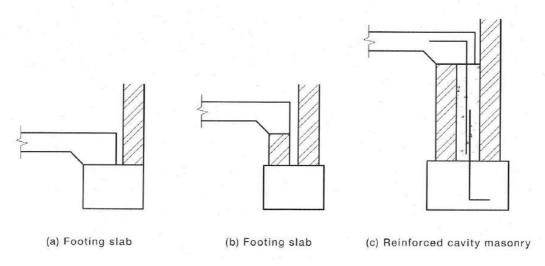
EXAMPLES OF FOOTING SYSTEMS REQUIRING JOINT TREATMENTS
